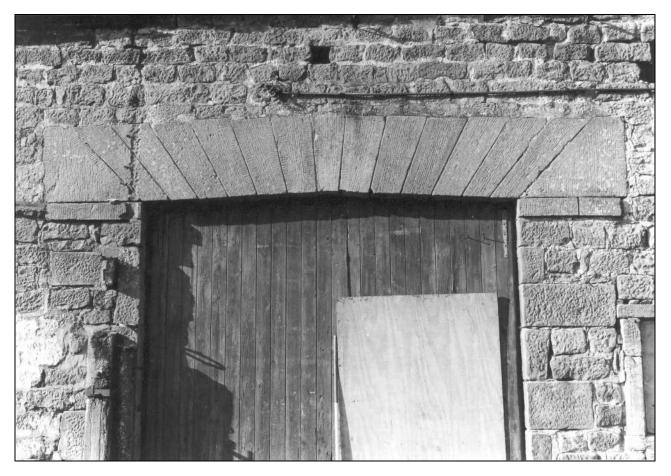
Detail of voussoirs over barn's east entrance (film 5, frame 10)
